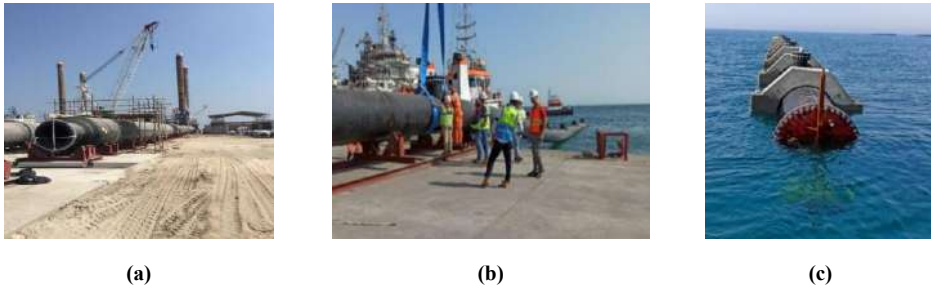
Onshore fabrication works. (a) Milaha Port site; (b) HDPE pipework being assembled; (c) HDPE pipework transition.
